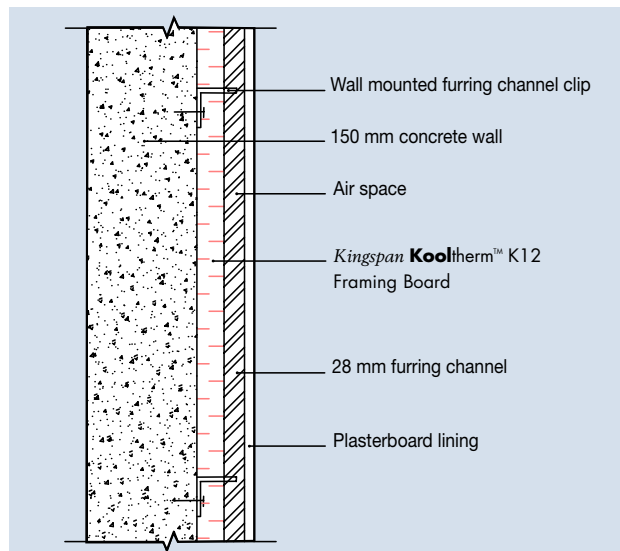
Side elevation of Kingspan Kooltherm™ K12 Framing Board clip-and-channel system
